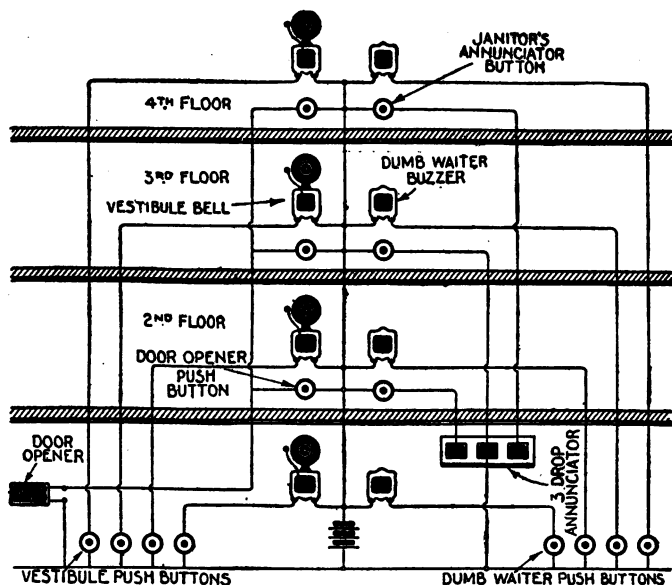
,345.—Wiring diagram for bells, door opener, janitor's annunciator and dumb waiter buzzer of a four story apartment house.
